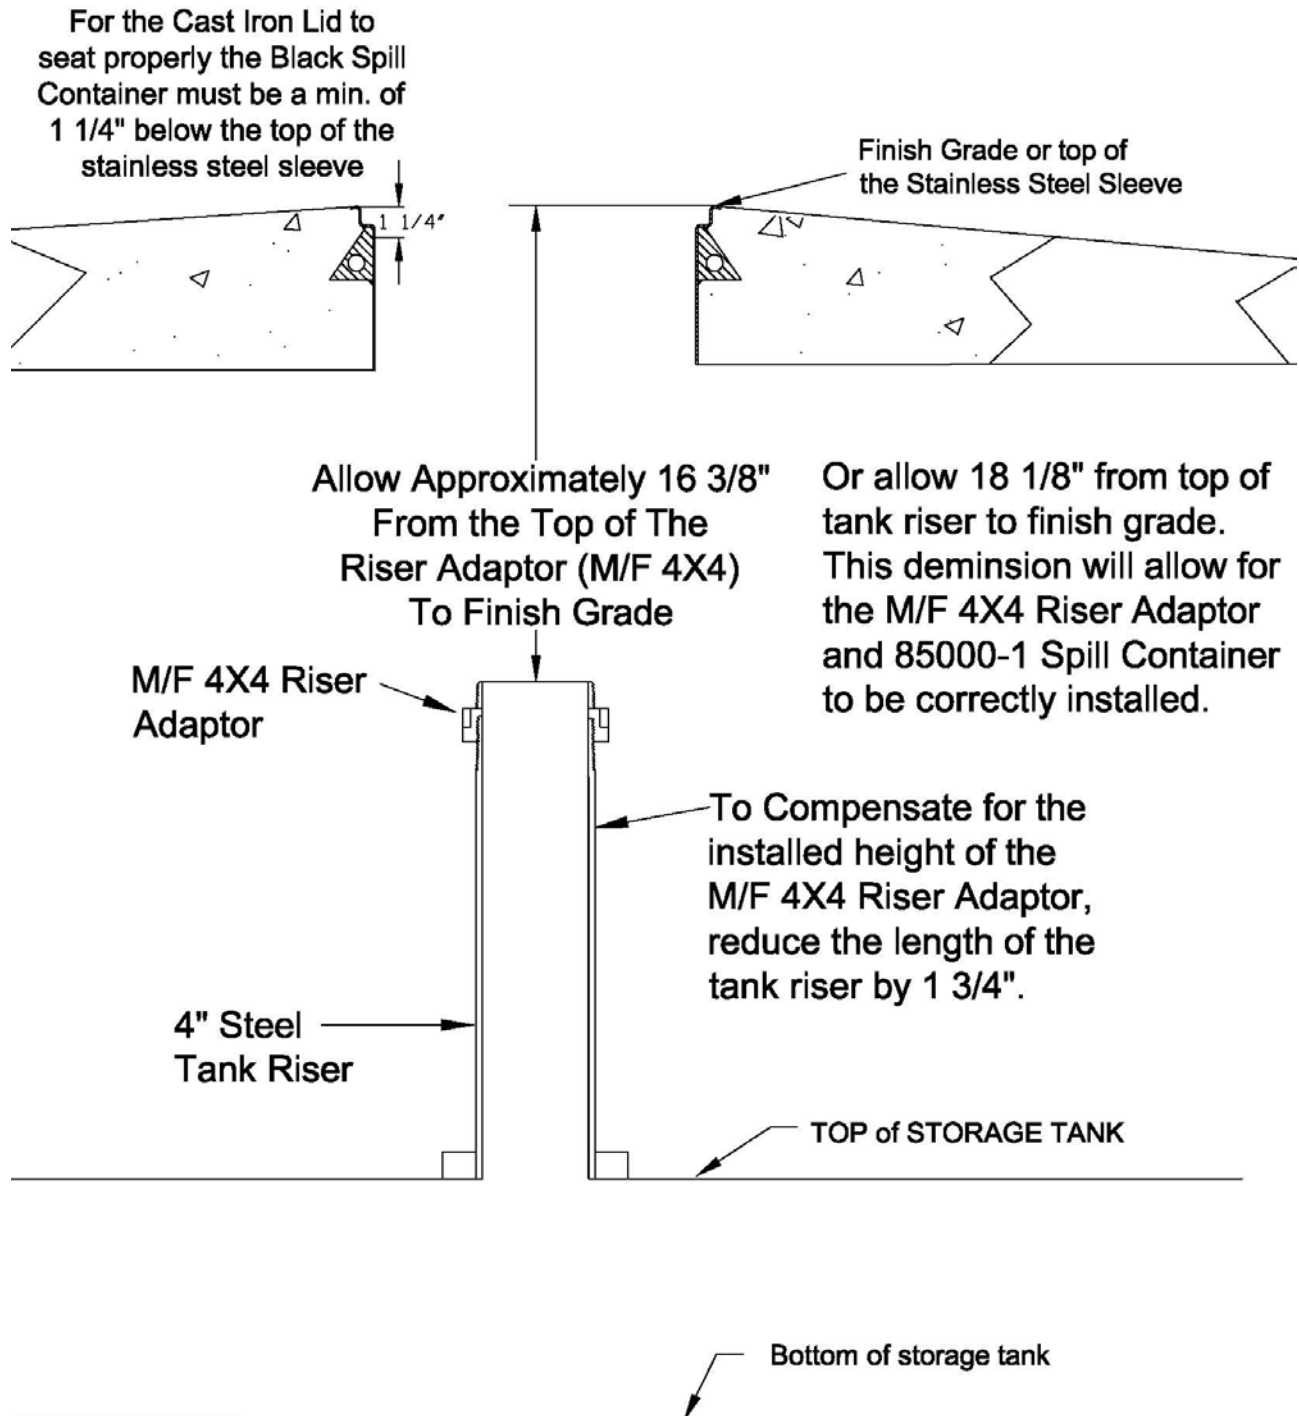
85000-1 EVR Spill Container Installation Dimensions
